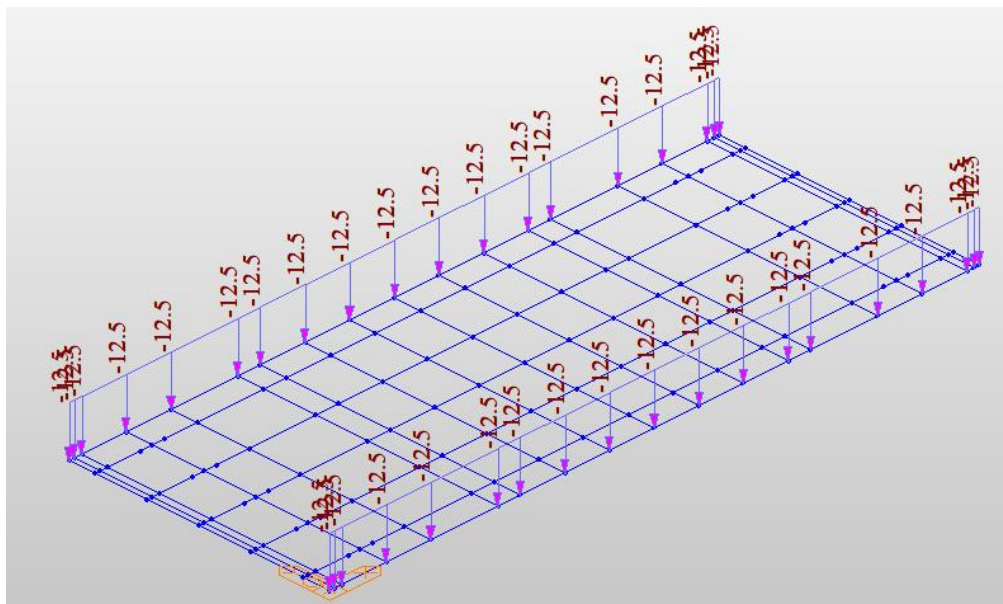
7 Crash barrier load applied in grillage model in MIDAS Civil
